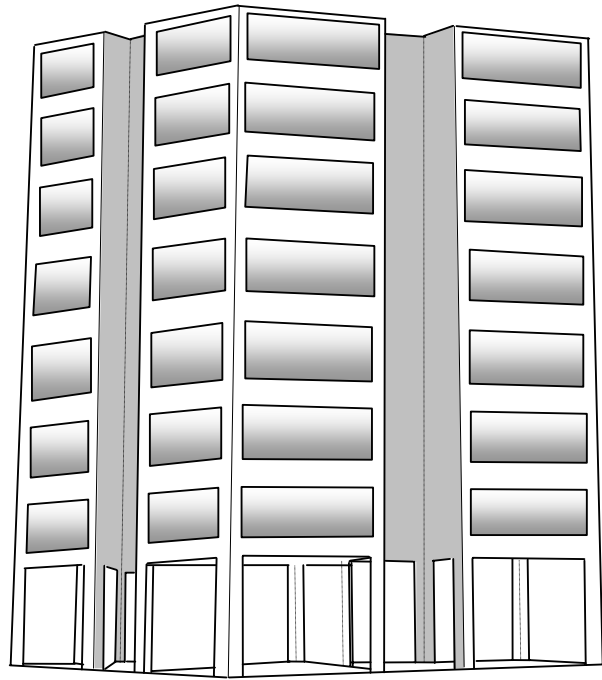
Buildings with full or partial area of ground floor having stilts
